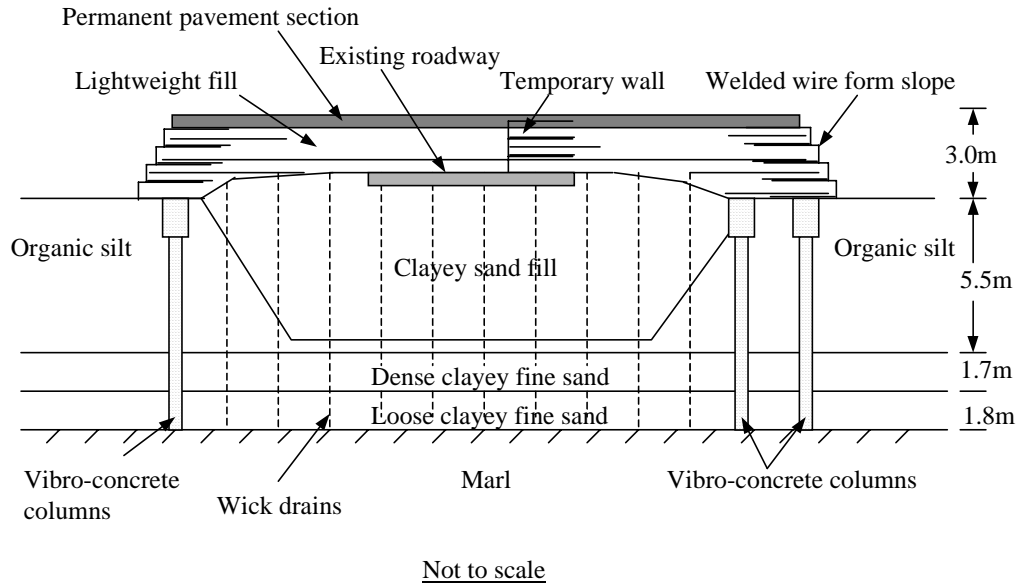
Typical Cross Section of Widening Roadway (Han and Akins, 2002)
